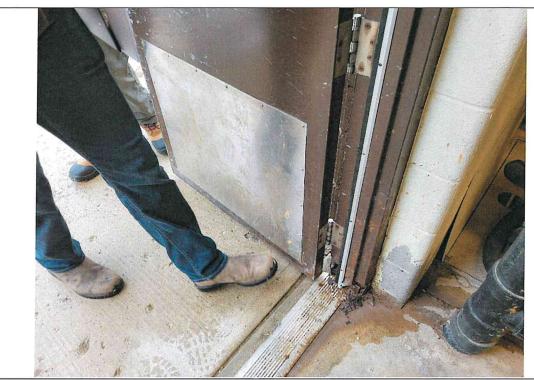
Exterior Metal Double Door. The Bottom Frame is Rusted w/ Section Loss. Bottom Sweep Missing.
